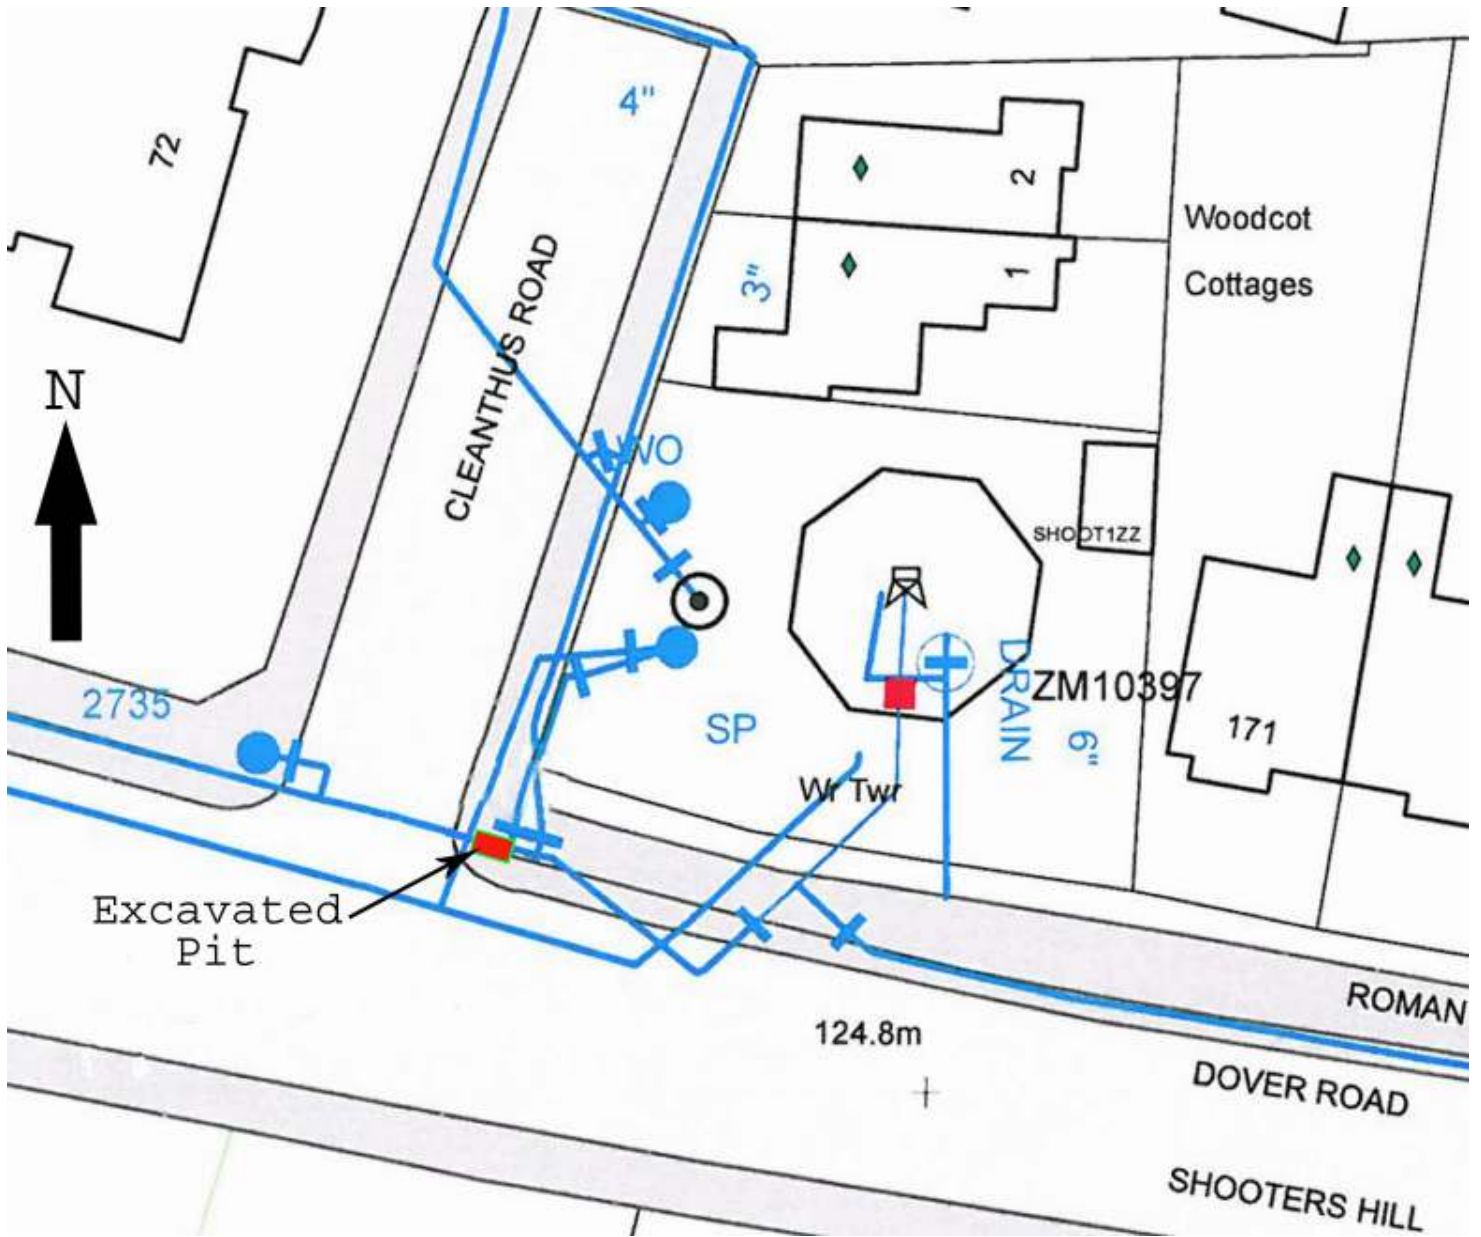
Location plan of excavated chamber pit. Modified from plan provided by Thames Water and used in WSI. (Scale 1:300)
